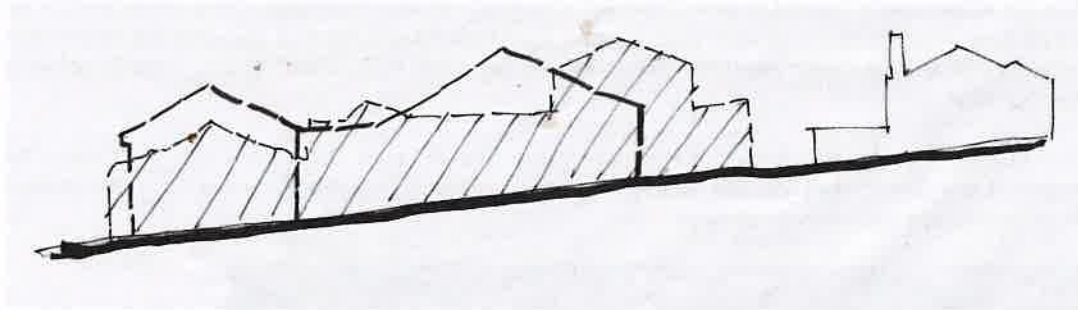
Rough diagram to illustrate the elevational shape facing Banks Street. Hatched area is the existing buildings. Barbara Hickson.
